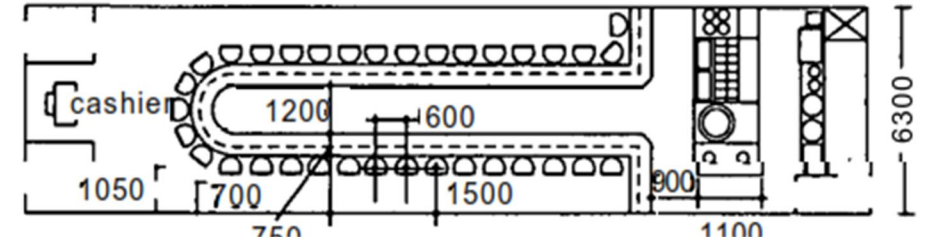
These drawings highlight several critical dimensions that the designer must consider. Some circulation must be adequate to handle other clearances in the restaurant.
